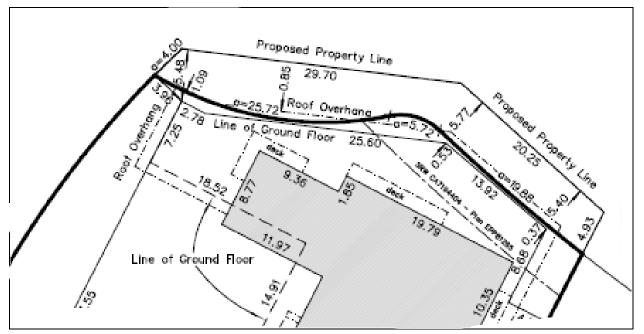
Survey Drawing showing the Proposed Property Line and Roof Overhang Encroachment
